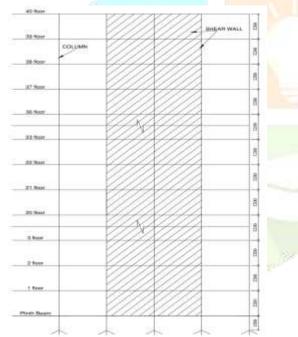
Elevation of rectangular geometry without outrigger belt truss system for zone III
